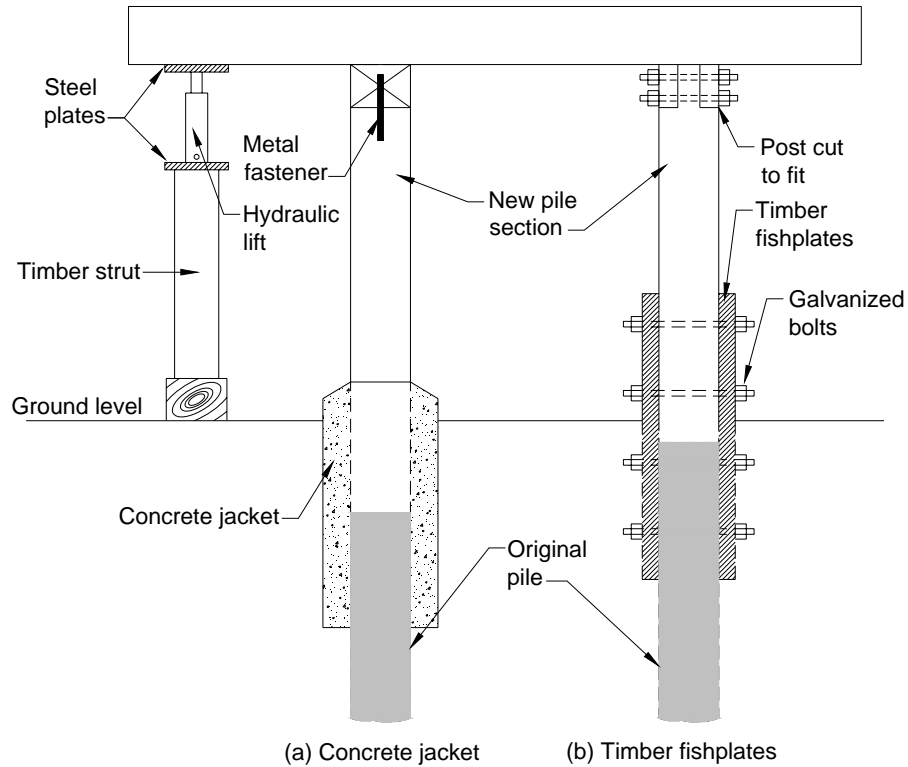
Splicing timber piles using concrete jacket or timber fishplate (Wipf et al. 2003a, and U.S. Army Corps. of Engineers et al. 2001)
